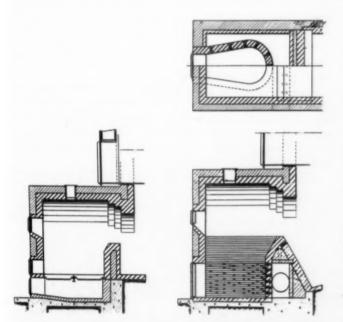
Flat grate for hrt boiler Fig. 3—Horseshoe or Cooke furnace for hrt boiler
